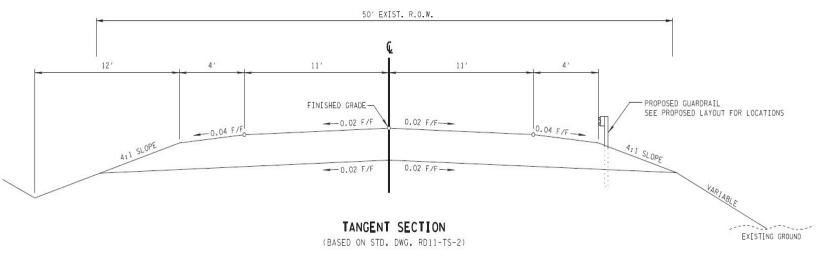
Typical Section of SR-436 over Reedy Creek, LM 0.68 in the 06/12/2019 Preliminary Plans.
